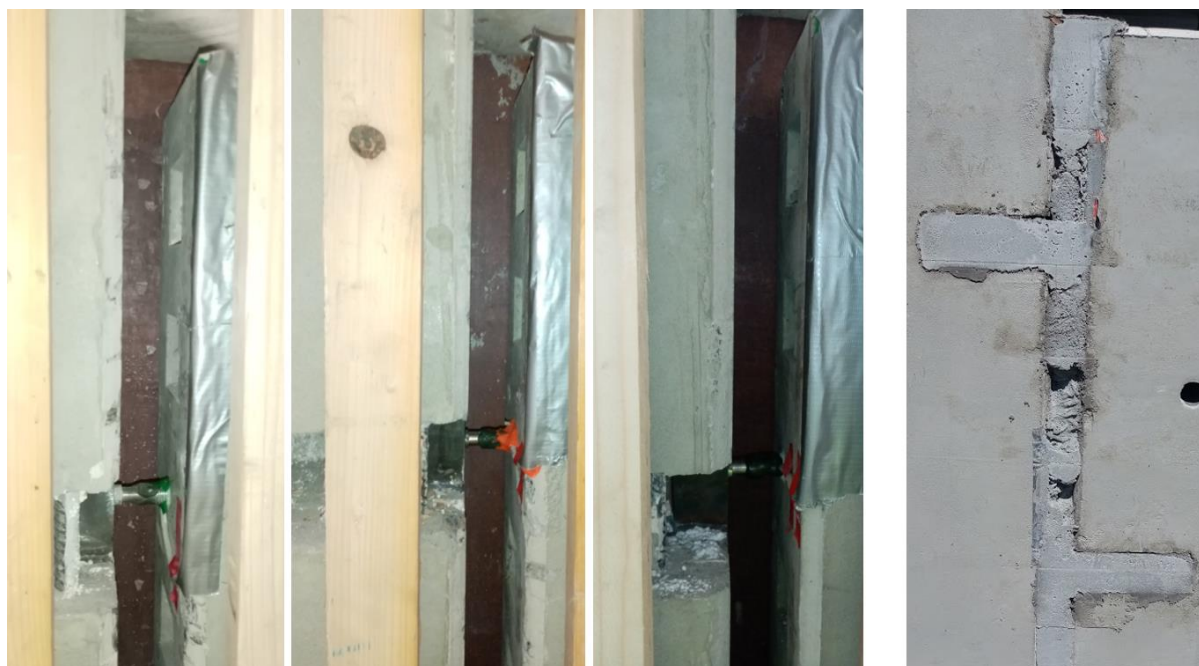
Joint casting (left image: test specimens before joint casting; right image: 1<sup>st</sup> test specimen before joint surface repairmen)
